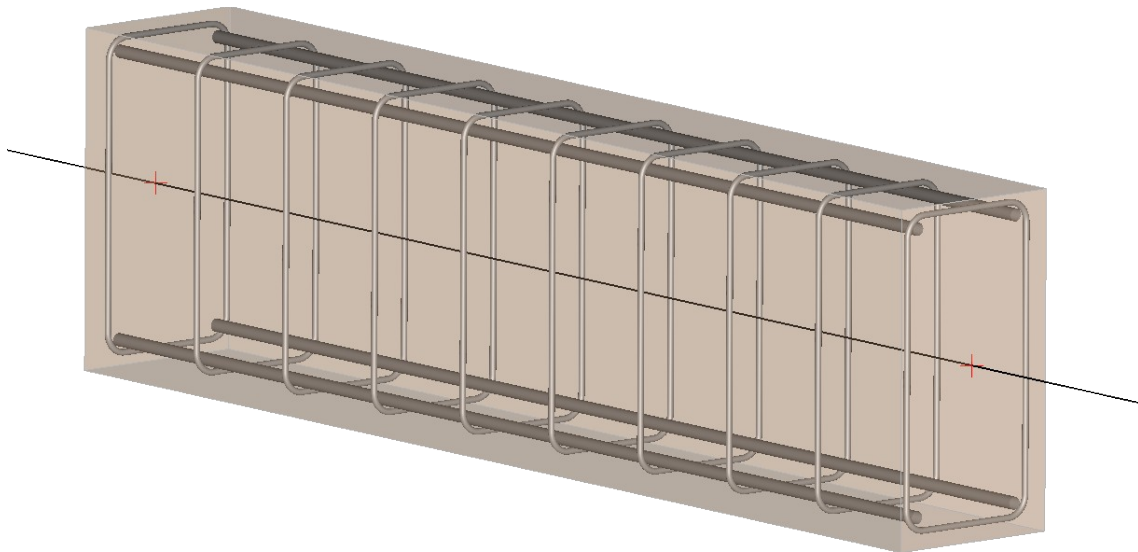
a : Beam reinforced concrete with frameworks and reinforcements.
